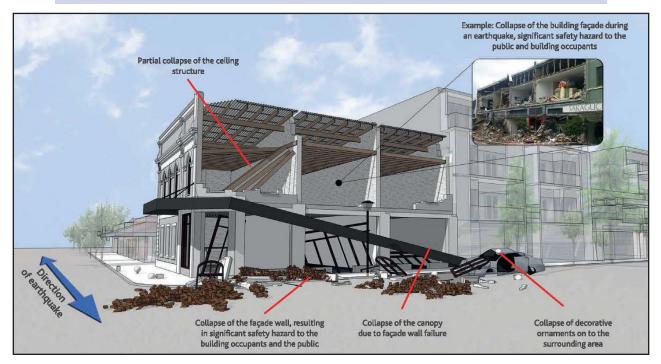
Illustration showing the other direction of earthquake forces acting on a building, with additional example damage. (Source: Auckland Council 2017, p. 25)
